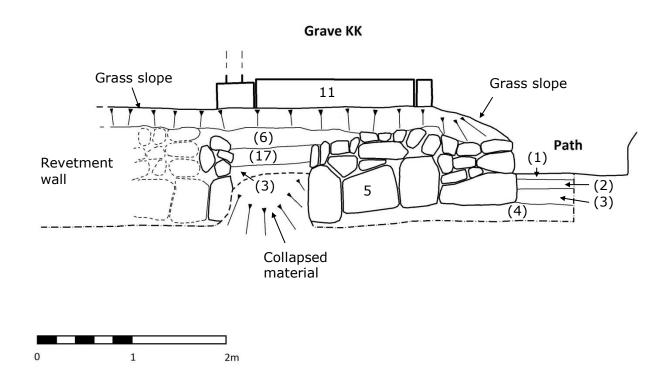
French drain section after revetment wall section (structure 5) collapse.
